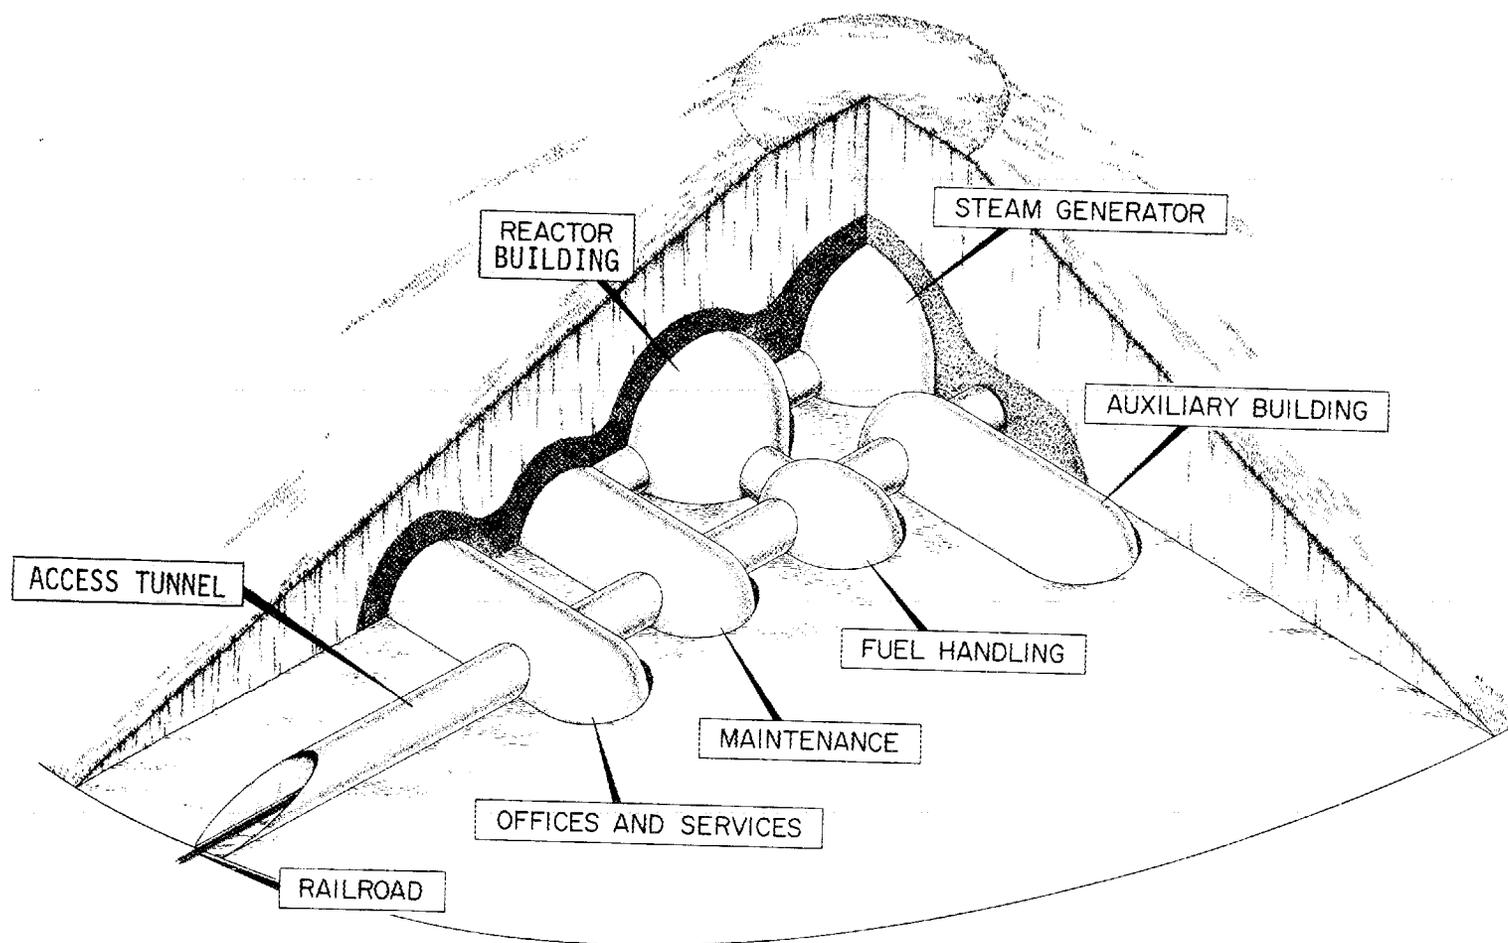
Cutaway View of a Berm Containment for a Large FBR System
